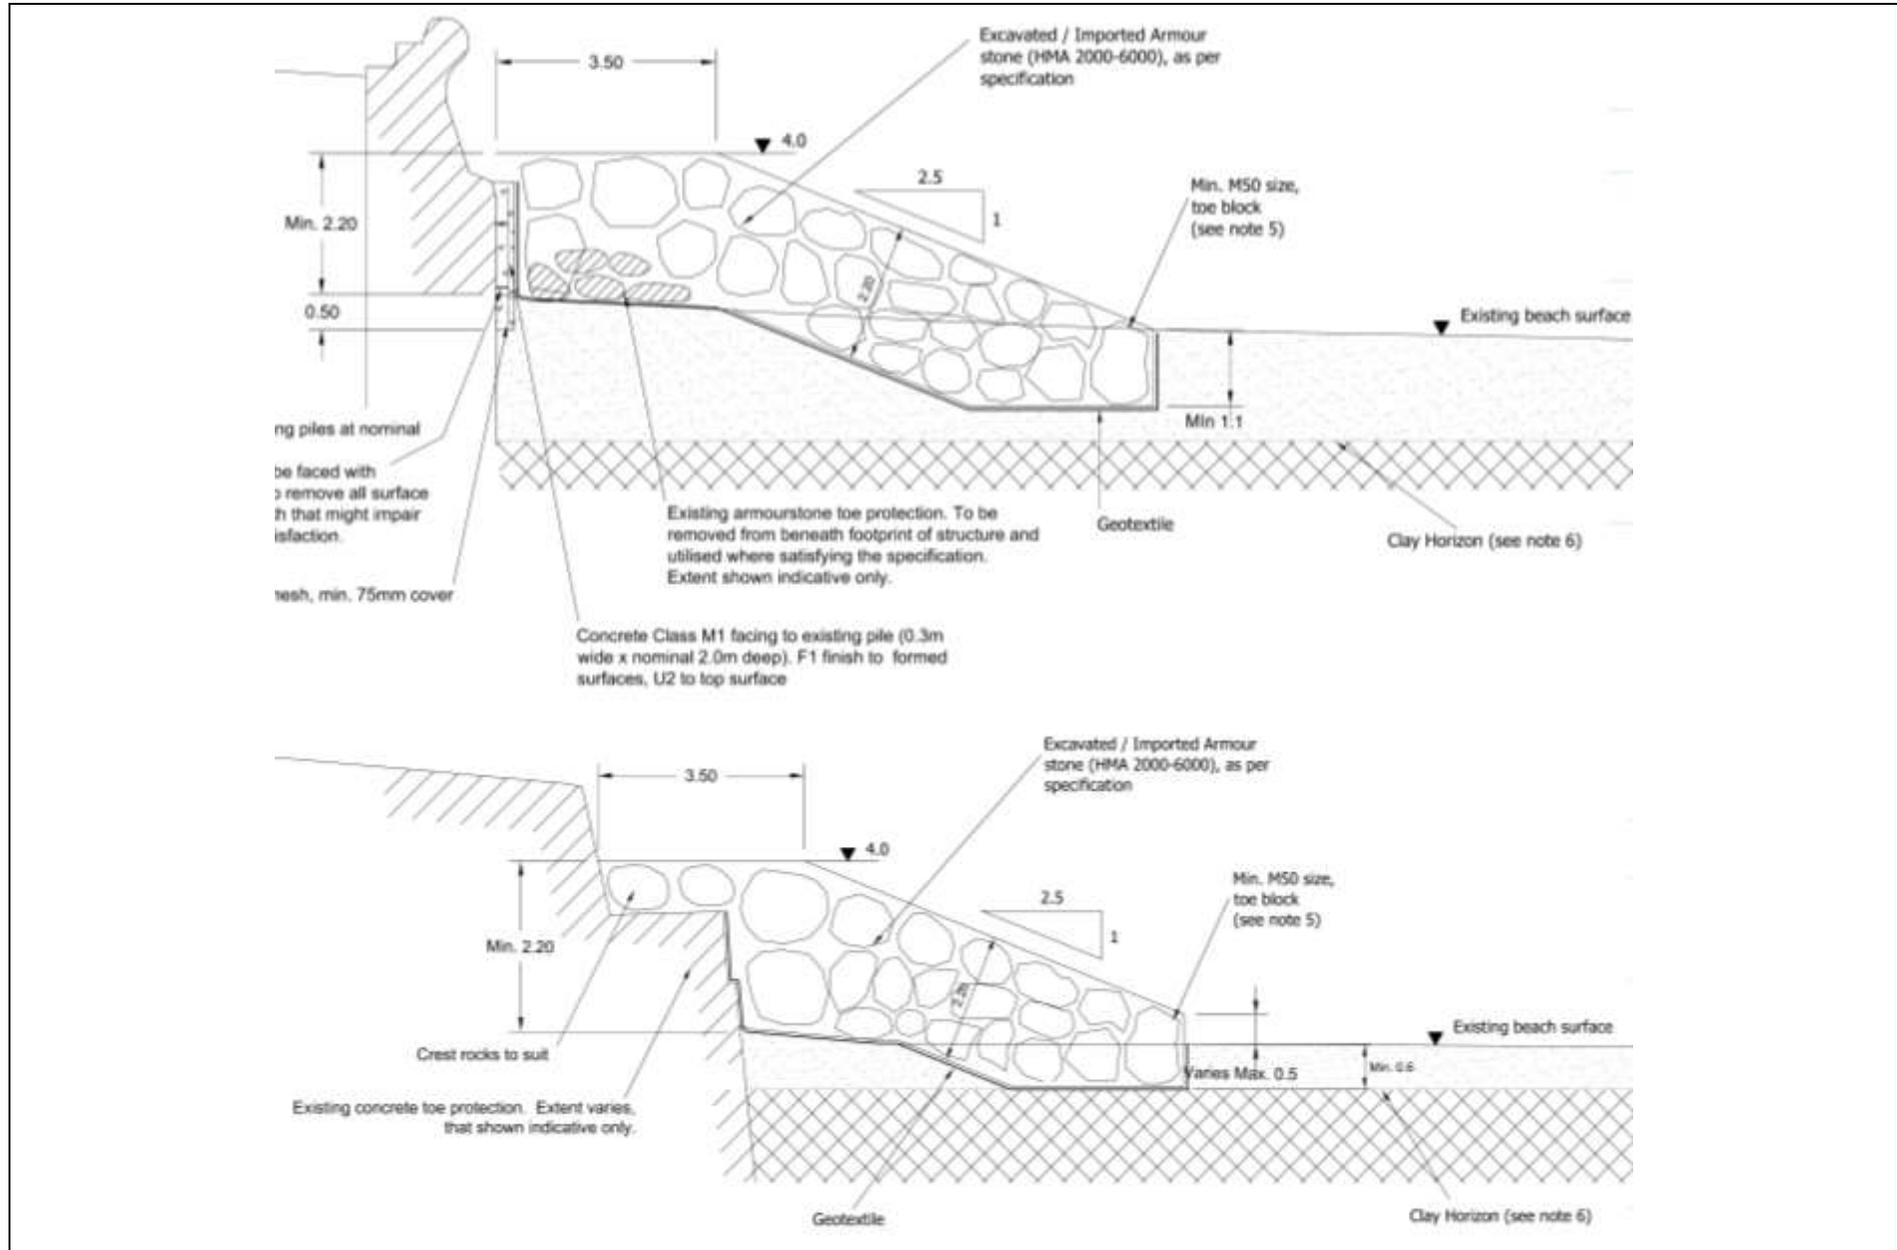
Typical Cross Sections through Existing Rock Armour Protection to Sea Wall
